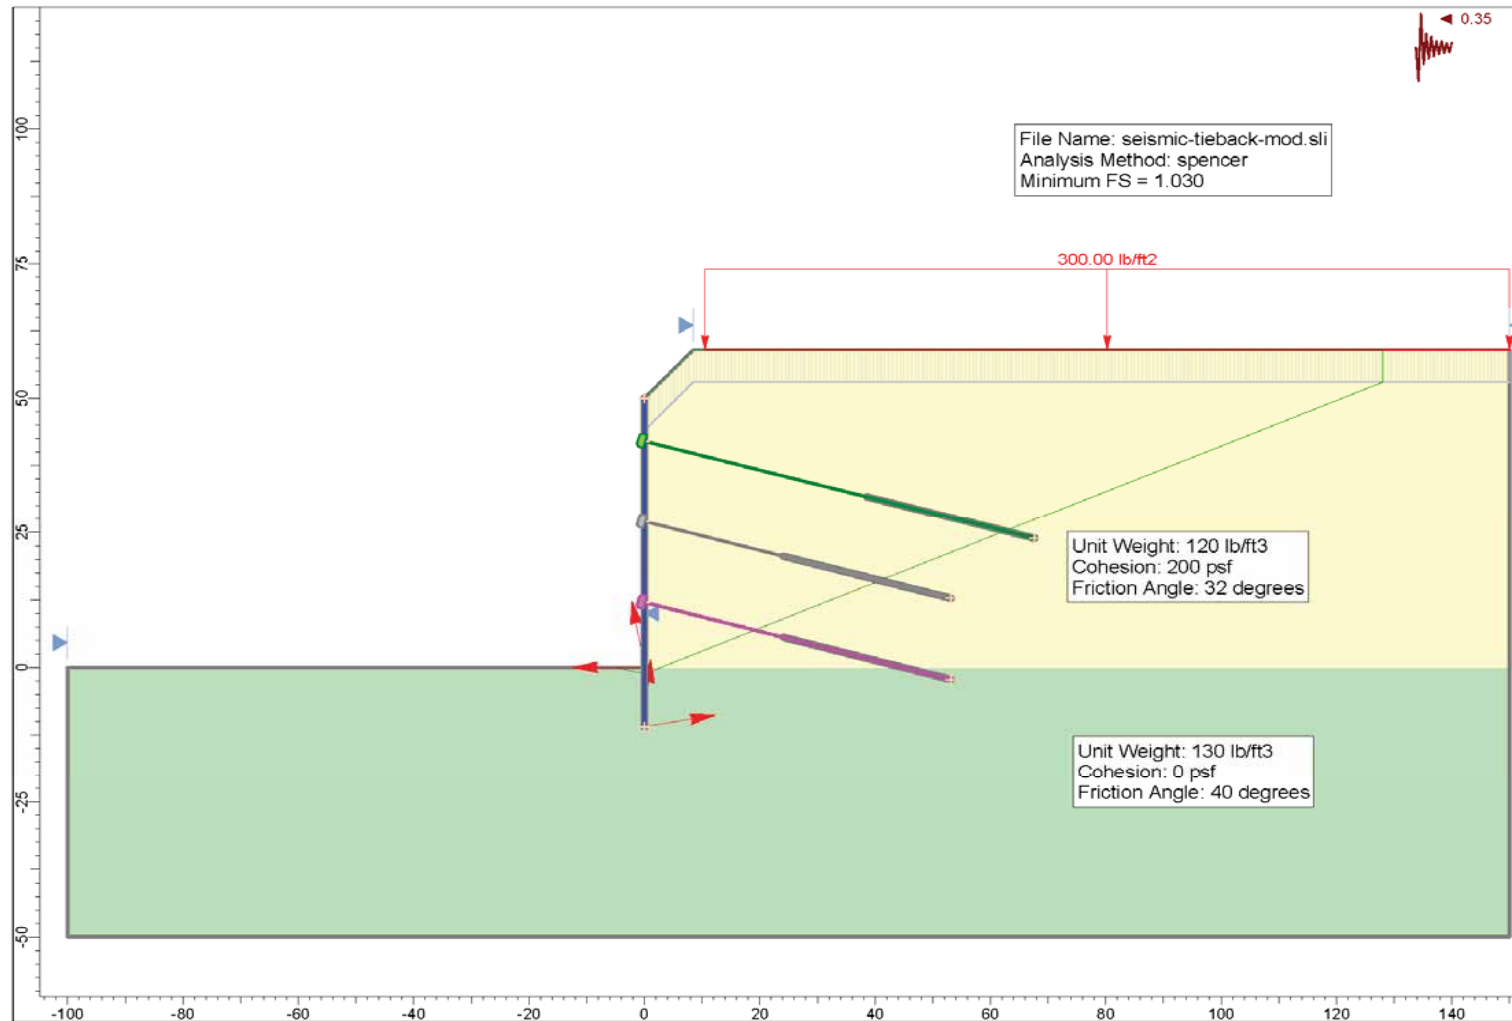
Global Stability for Seismic Condition, Planar Failure Surfaces, Revised Anchor Loads
